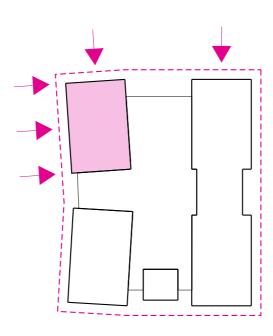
Plan diagram showing permitted massing configuration of G1.
